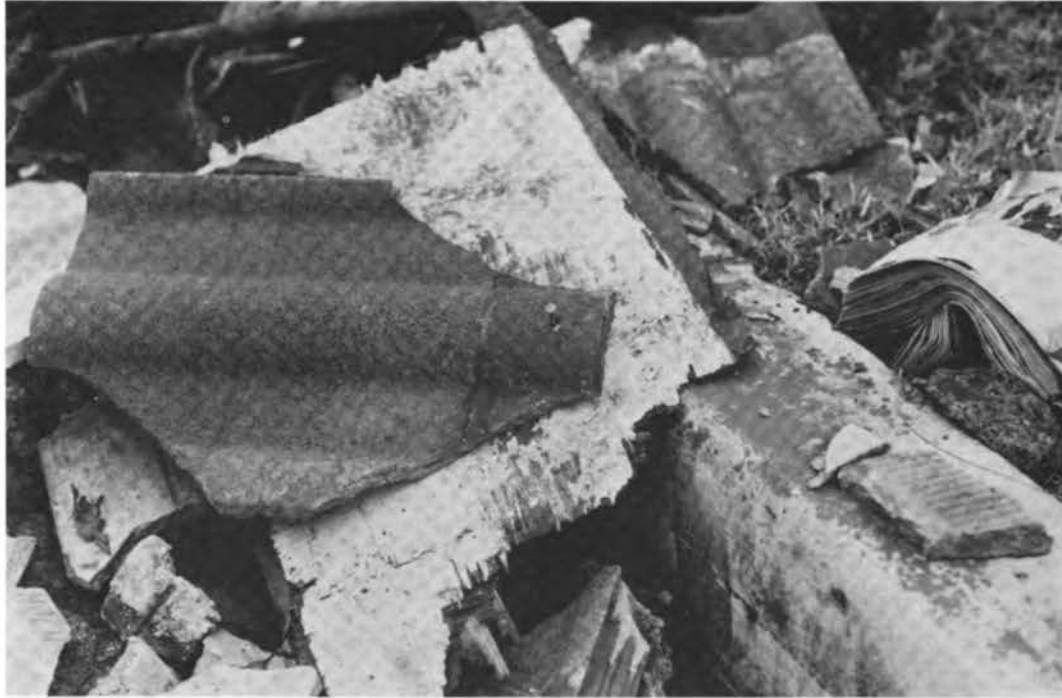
Monier-type roof tile (note single 8d nail fastener).
